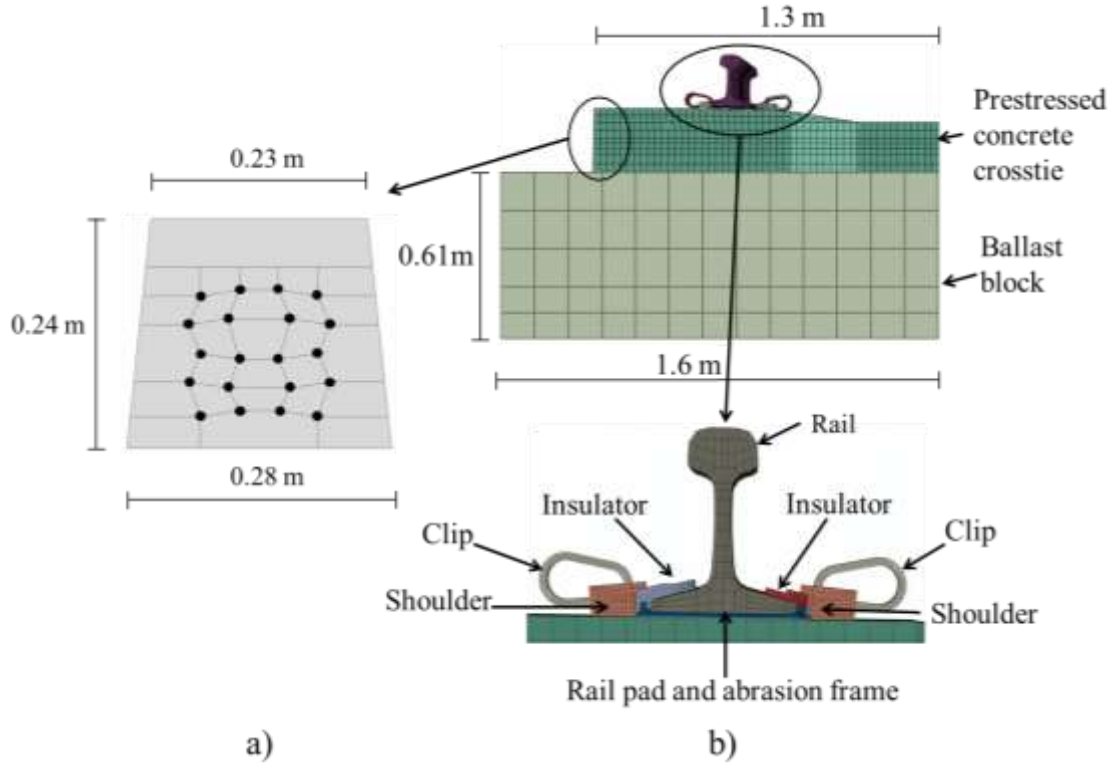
a) Configuration of the 3D concrete crosstie model and b) fastening system FE model
